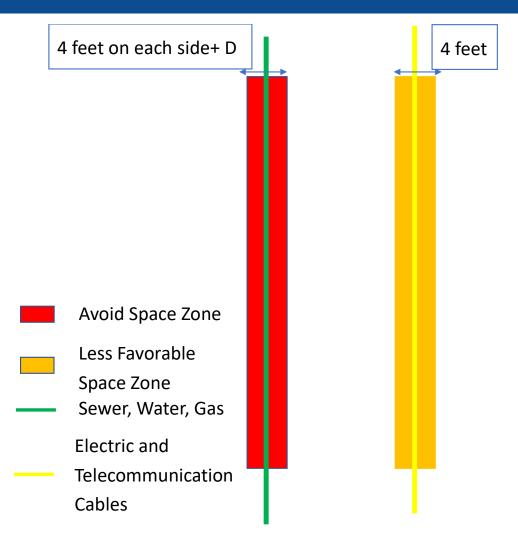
Subsurface Structures Avoid Space Zone and Less Favorable Space Zone
